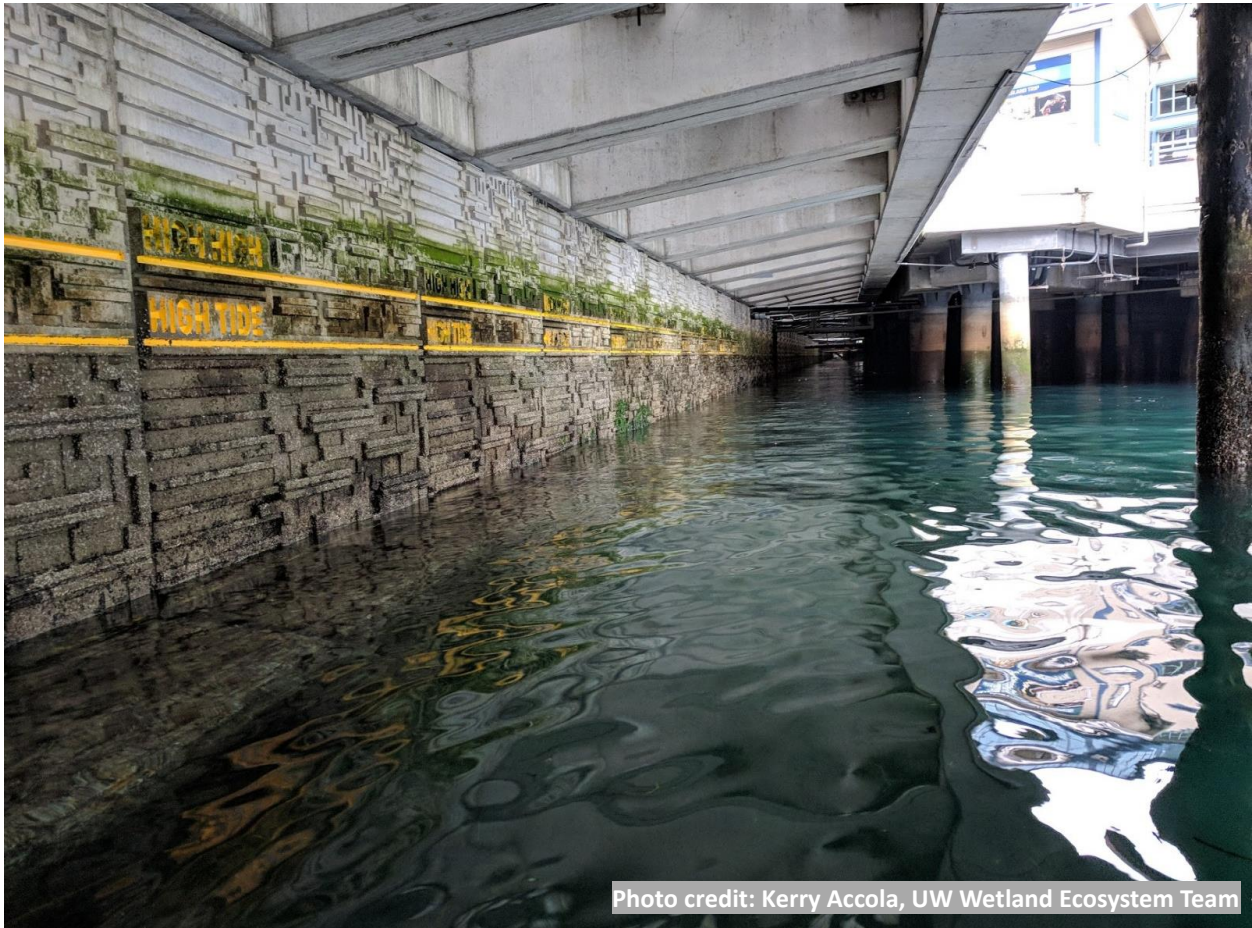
Underneath the cantilevered walkway at Elliott Bay (used with permission)
